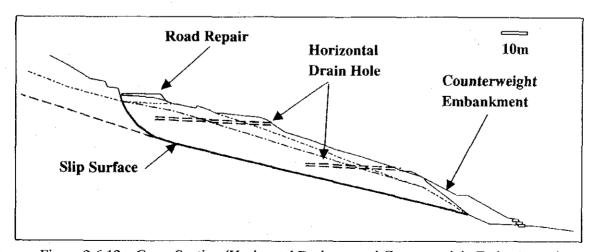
Cross Section (Horizontal Drainage and Counterweight Embankment)
